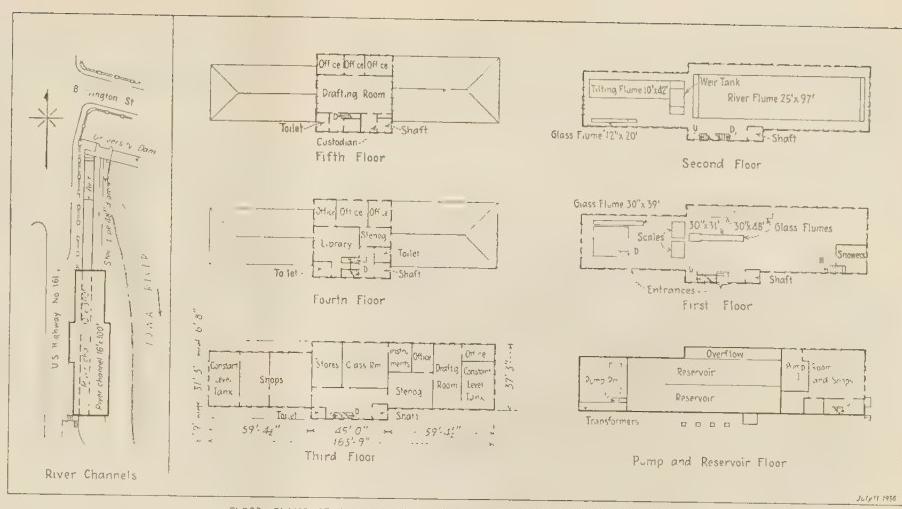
PLAN OF HYDRAULIC LABORATORY AT IOWA STATE UNIVERSITY
